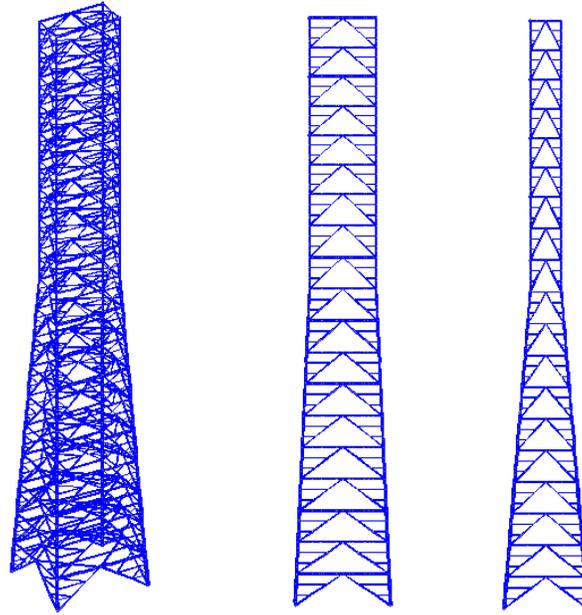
Flare Derrick Structure - Overall View STAAD Pro Model
